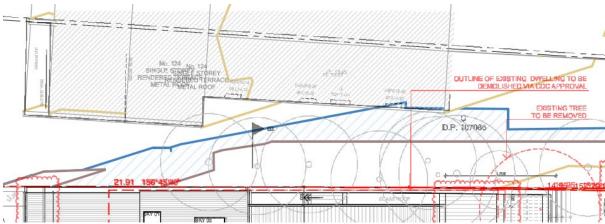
Overlay of site submitted site plan and shadow diagram for 2pm during winter solstice
